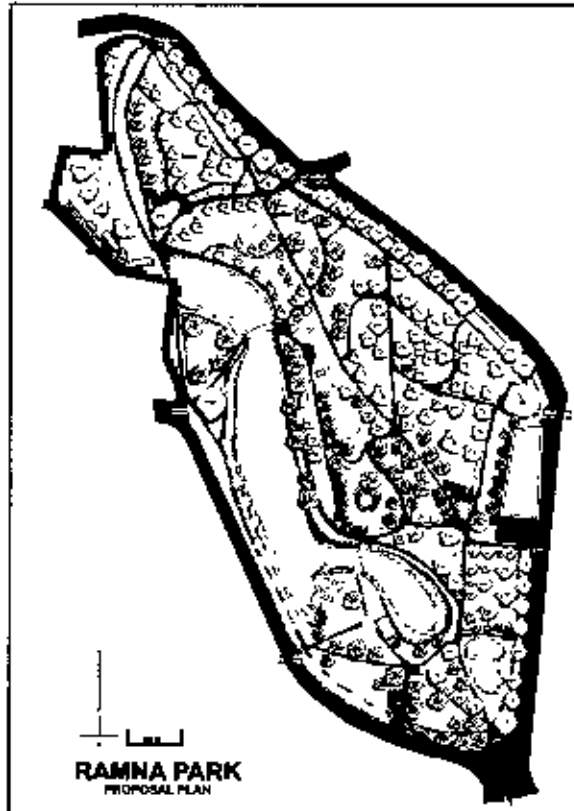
Proposed Layout of Ramna Park, 2006, (Source: Department of Architecture, GOB)
